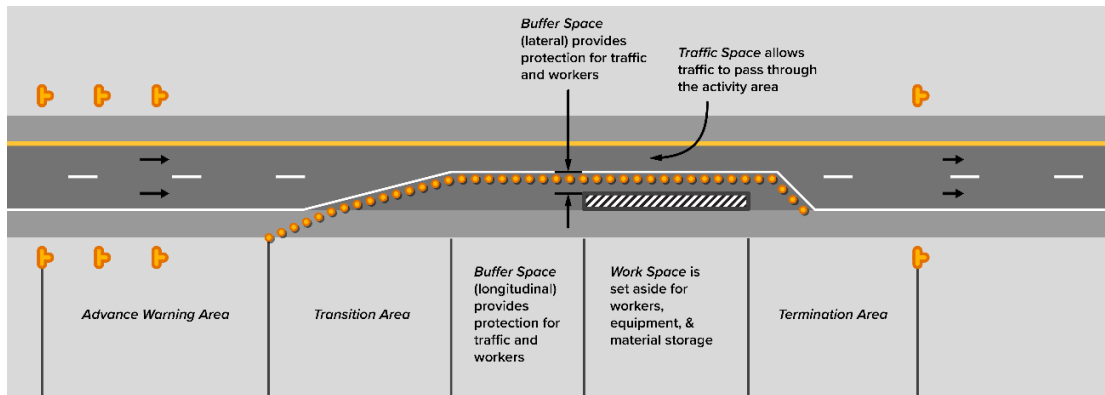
Work zone layout (Nevada LTAP, n.d.)
